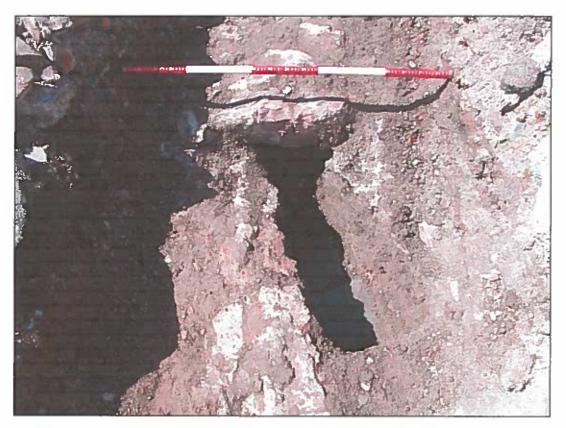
New foundation trench, with exposed 18th century culvert remains at far west end of trench.
